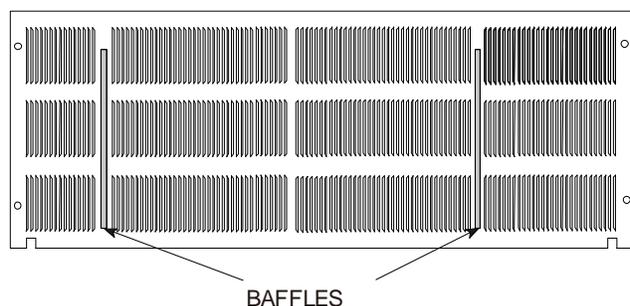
Remove Existing Outdoor Grille Baffles on Competitive Grille
